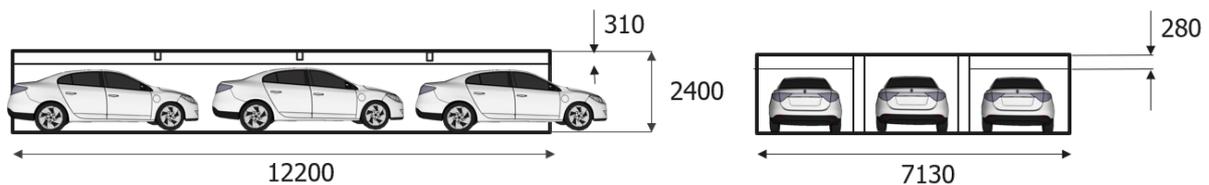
Dimensions of the experimental set-up (dimensions in millimeters)
